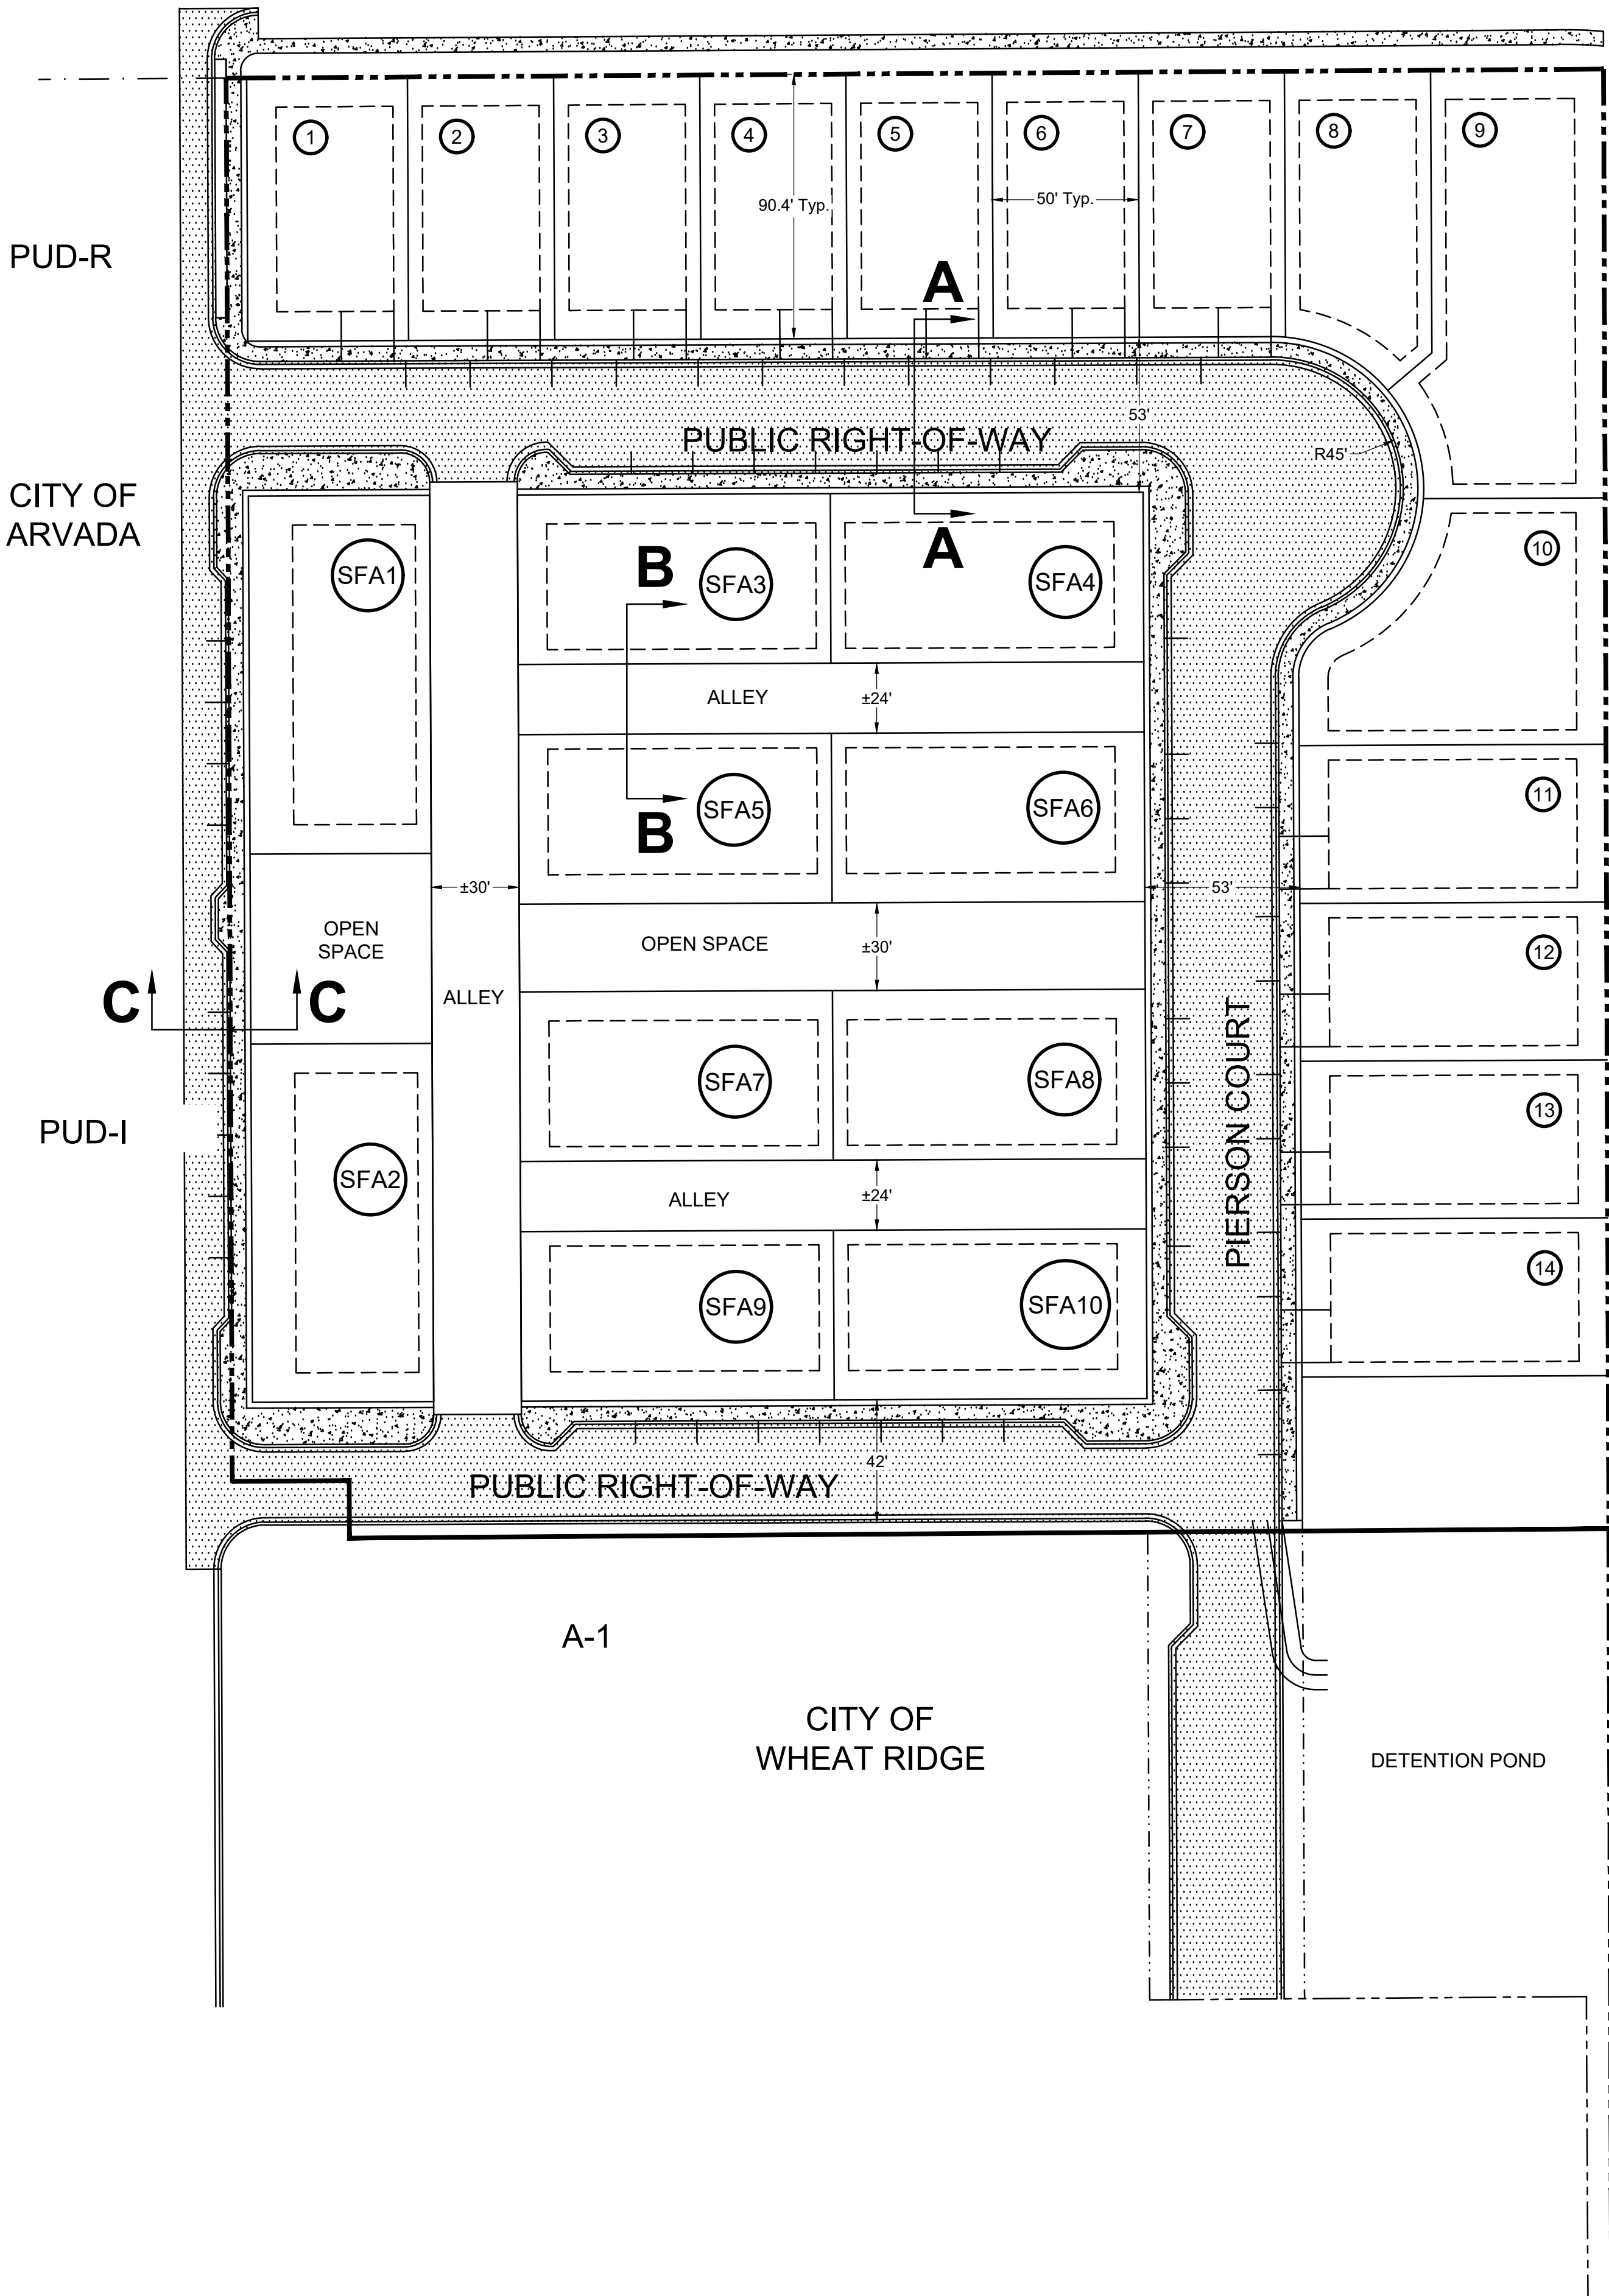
OUTLINE DEVELOPMENT PLAN
